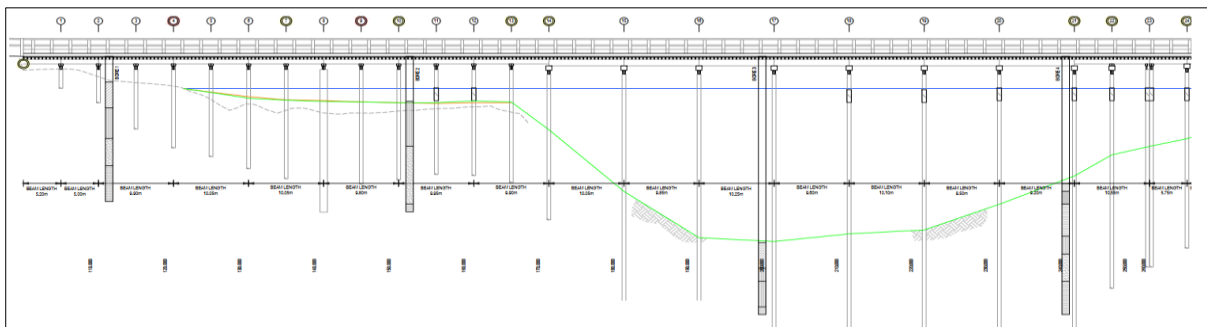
Bridge Longitudinal Section 1 (Source: Ref [1])
